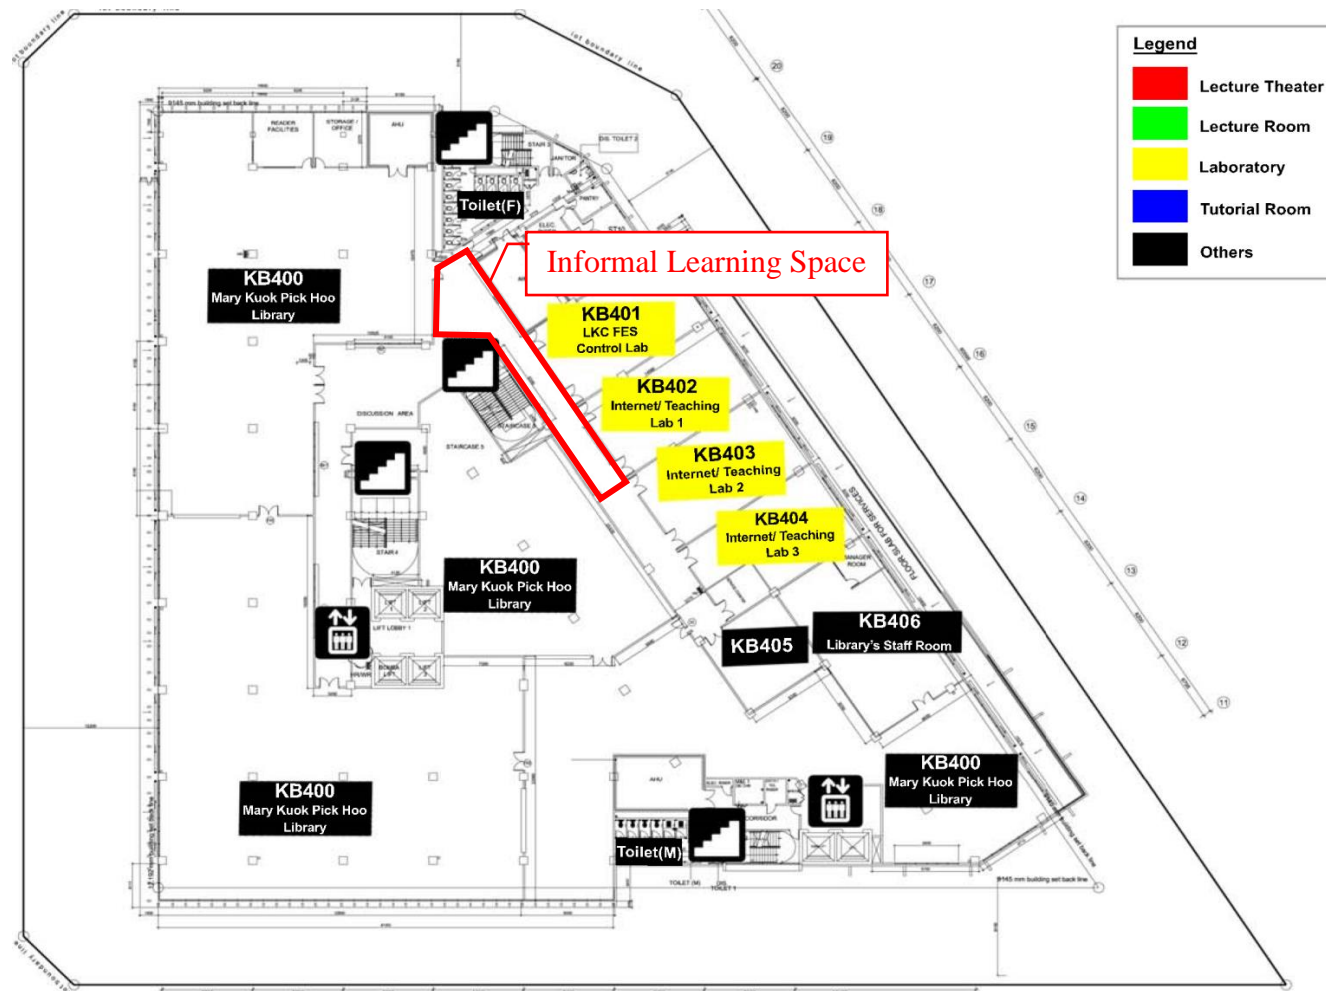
Sungai Long KB building floor plan – 4th floor.
